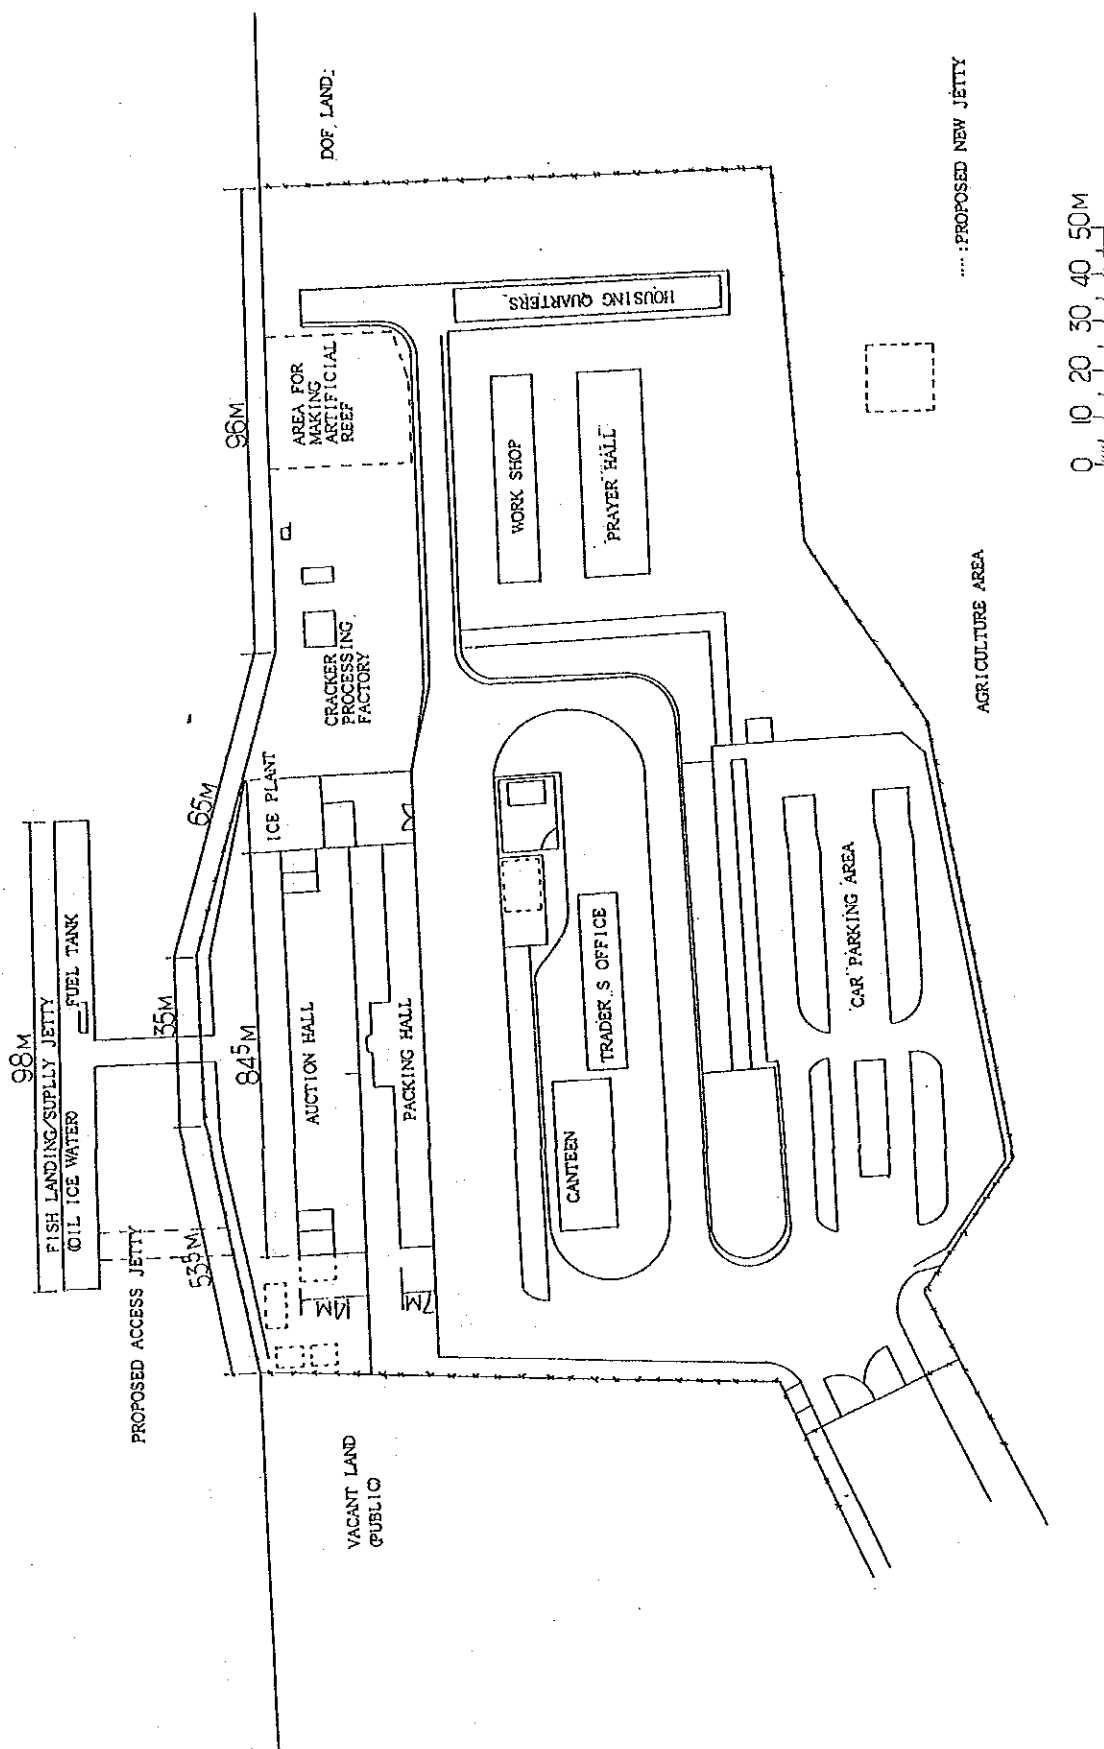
General Layout Plan of LKIM Complex of Kuala Sedili
